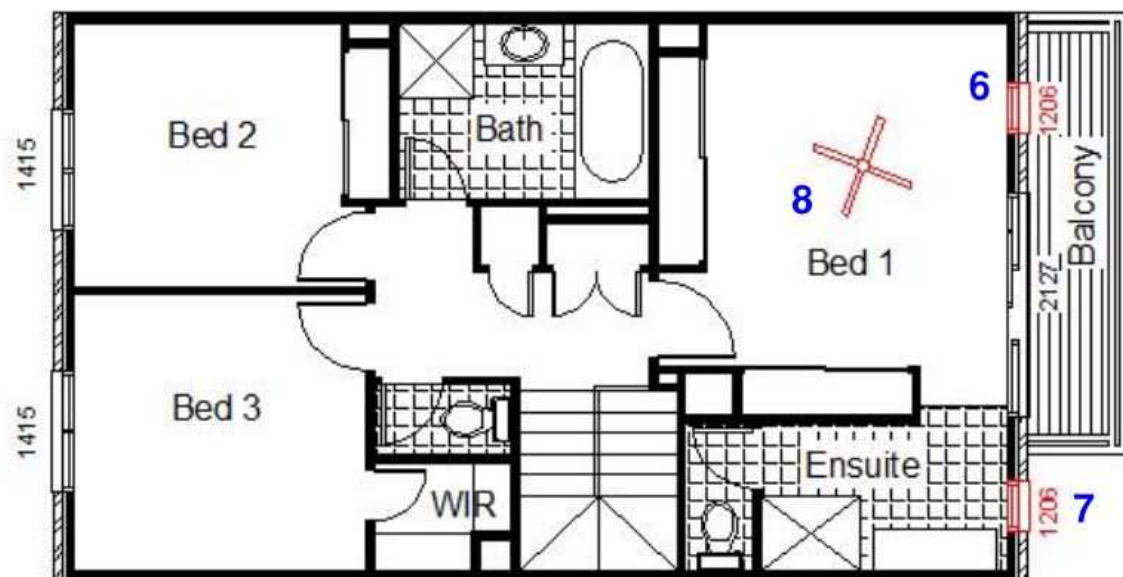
Redesigned first floor plan for Dwelling 16 in Brisbane.
